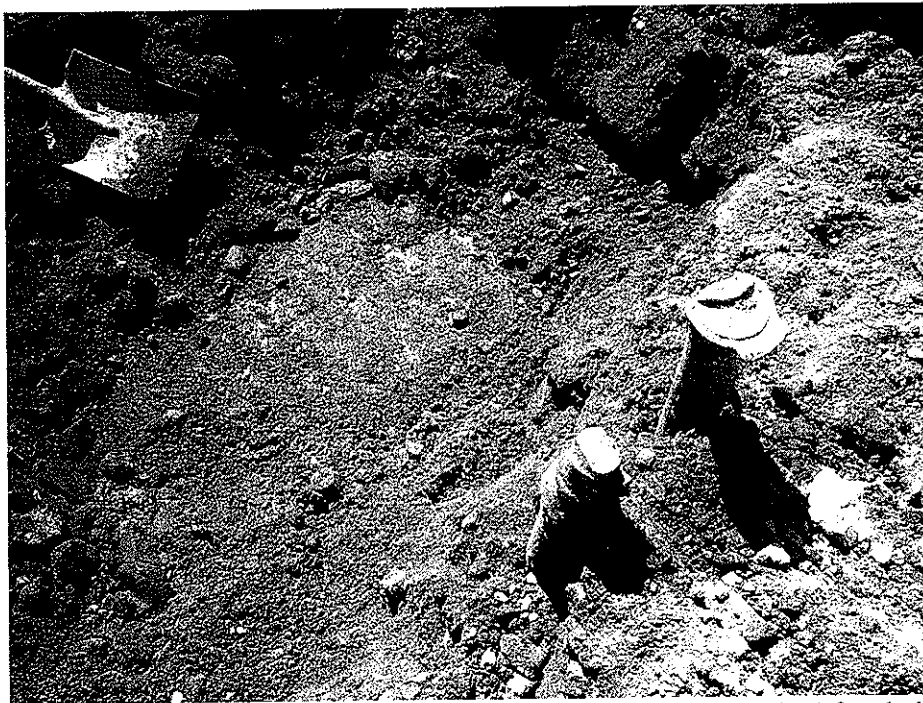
Fifth Street Test Pit revealed a concrete pad at approximately 4 feet below the surface grade. The “fuel oil” fill port was encased in the concrete.
